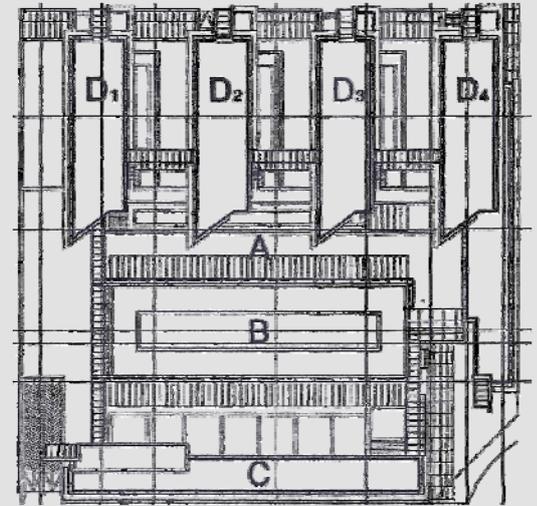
Plan view of the buildings (B is the existing building, C and D_n are the new buildings)
